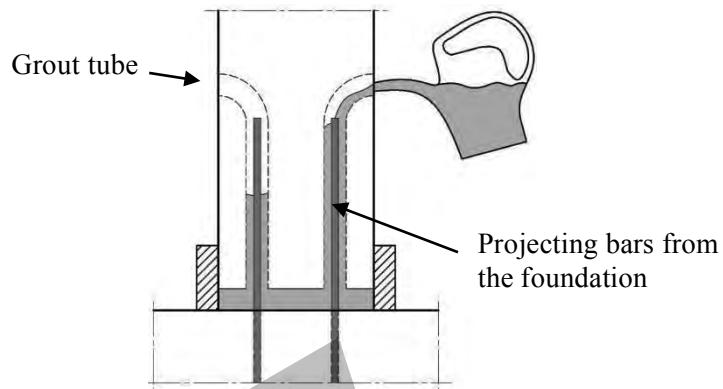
Anchorage of projecting bars in grouted tubes
